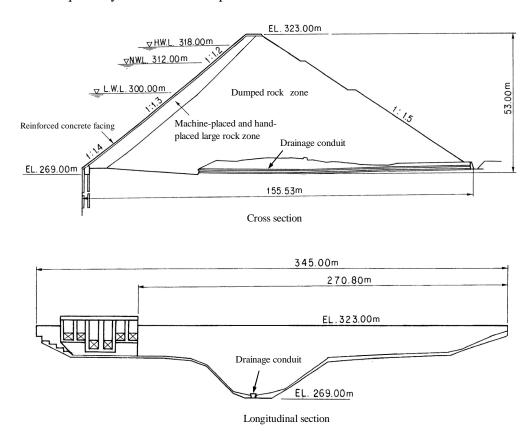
Cross section and longitudinal section of Ishibuchi Dam
